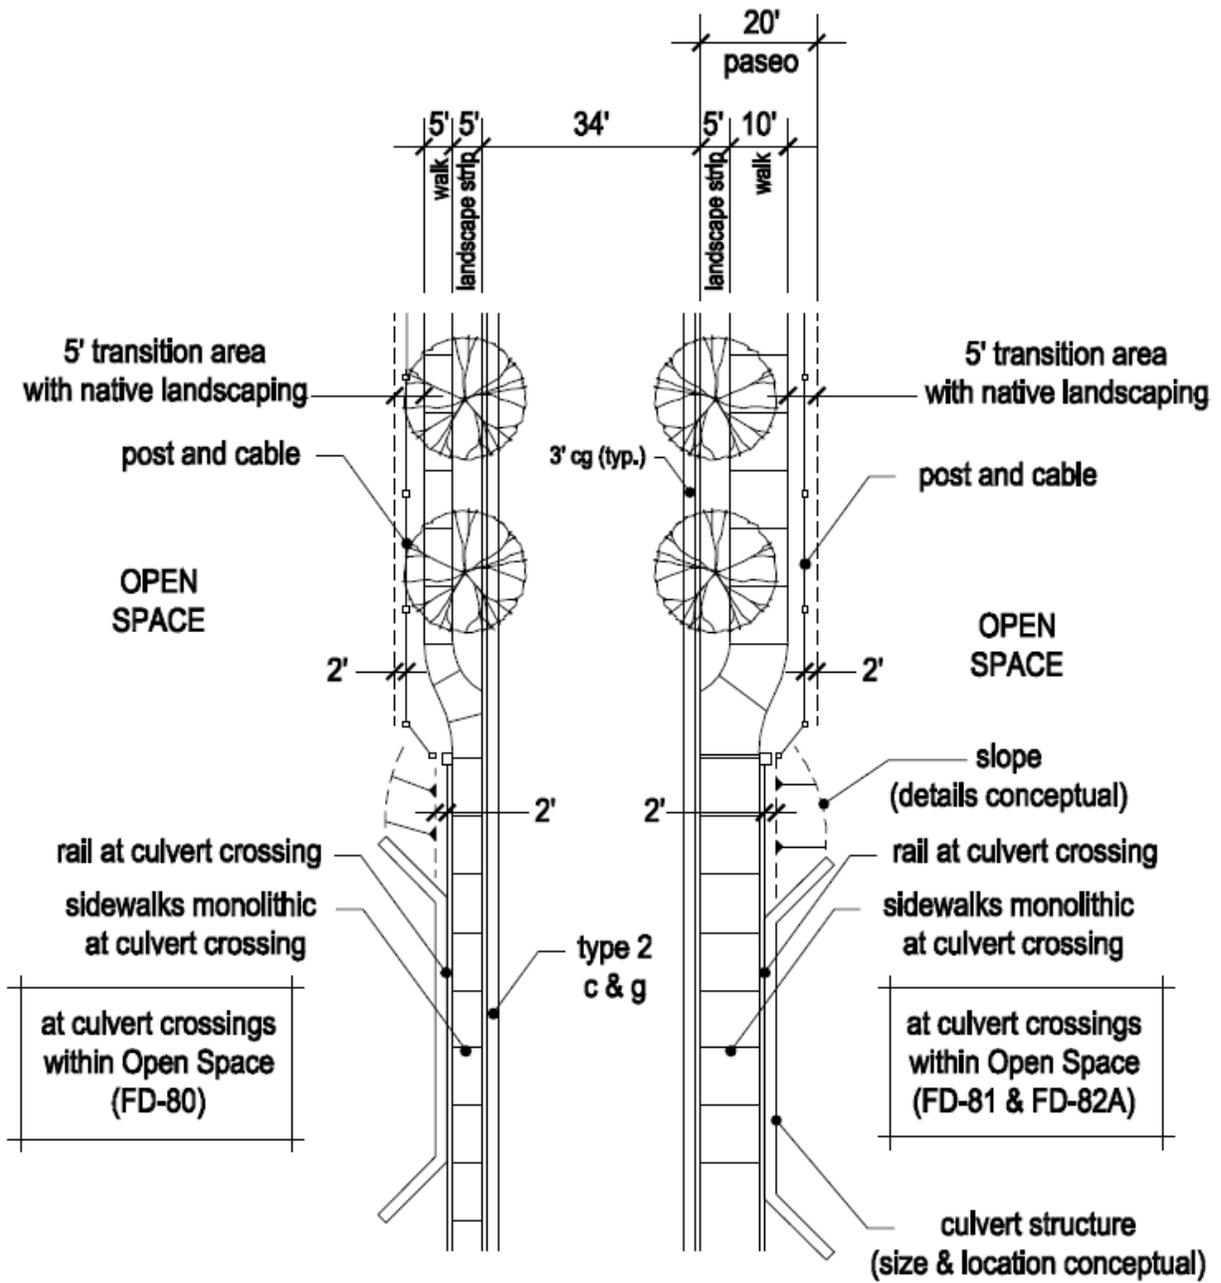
Primary Residential Street Paseo (at Open Space and at culvert crossing)
